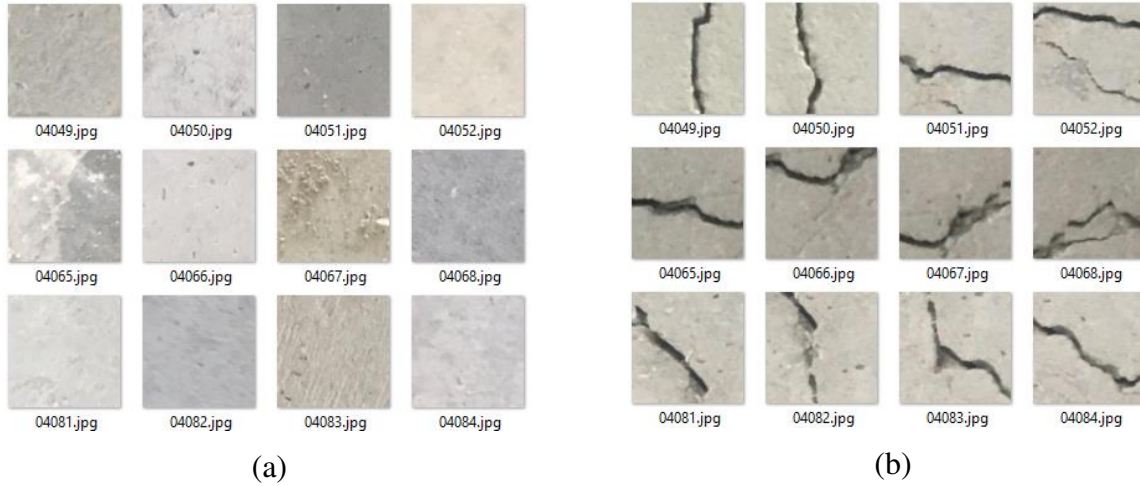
Images of the concrete surface (a) Undamaged (b) Crack
